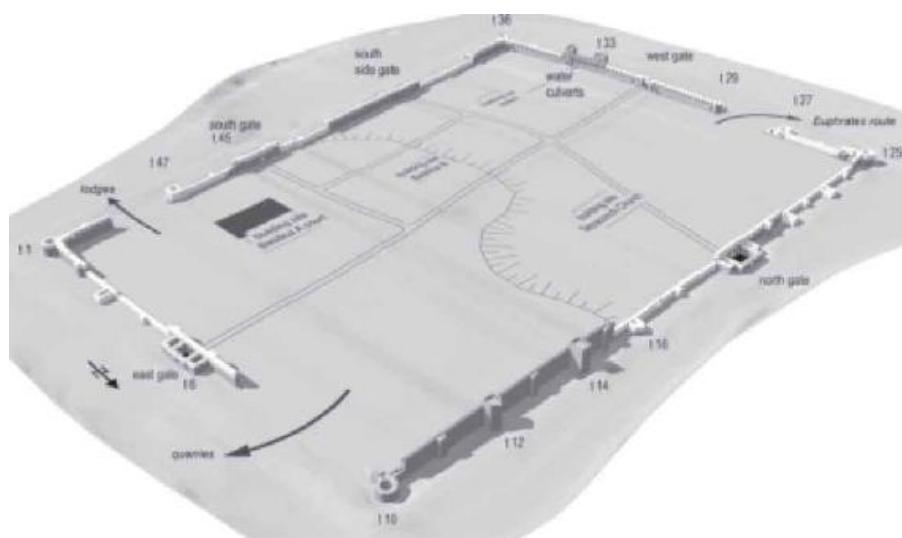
Resafa, city wall, reconstruction of building stage 3. Further sections are being closed, new towers rise only in rectangular form. Towers rise slower than curtain wall. Three partitions stay open as operational gaps for traffic (N. Erbe & C. Hof).
